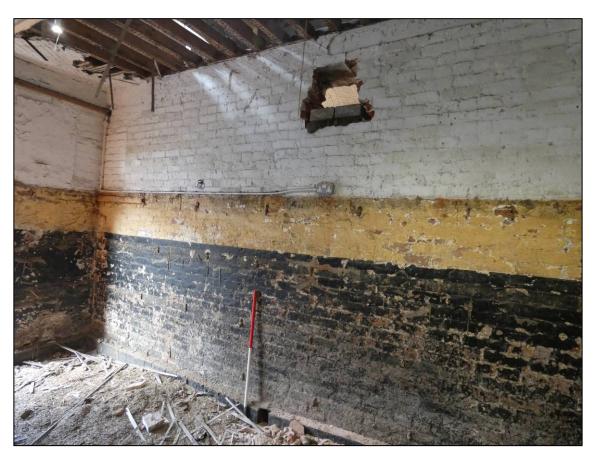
East range, ground floor loose box (GF3) during alterations, north wall showing decoration and blocking at west end, looking W (photo 2/124).
